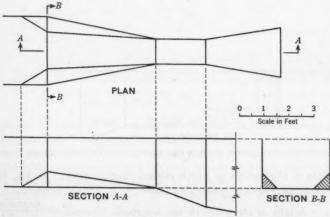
Parshall Design, 45-Degree Fillets in a 1-Foot Parshall Flume
